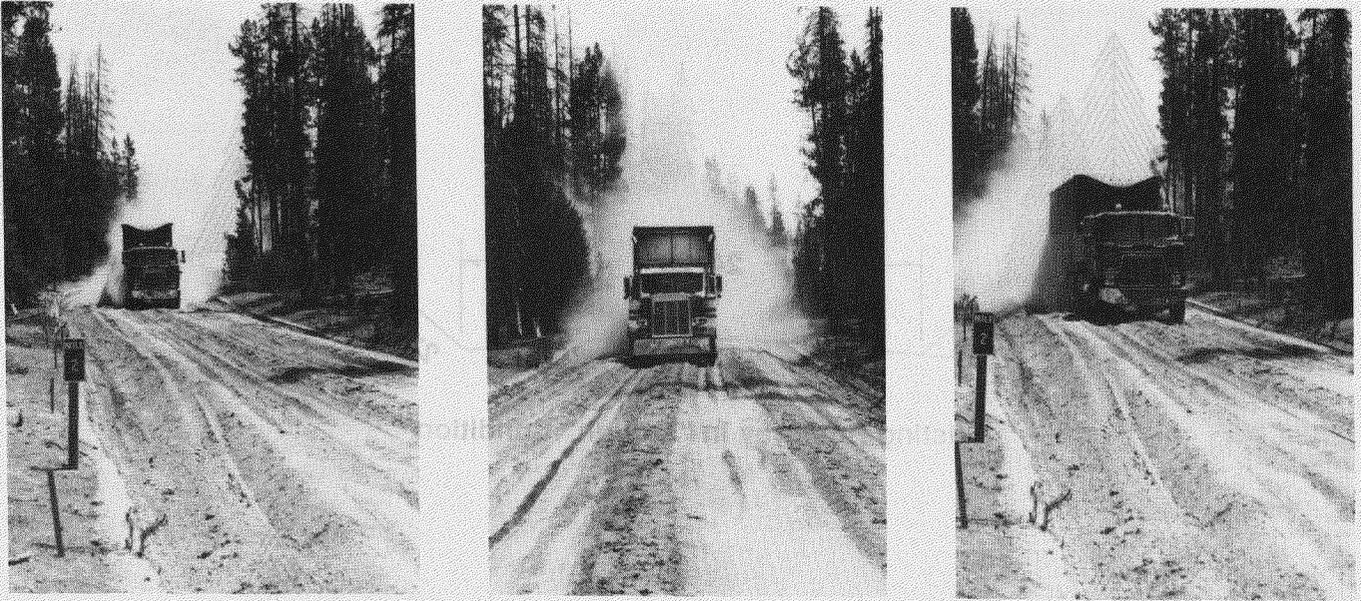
(left, middle, and right) Segment II 2 weeks after completion in June 1988. Chip van approaching chunkwood segment (note the dust and rutting of the chunkwood section).
